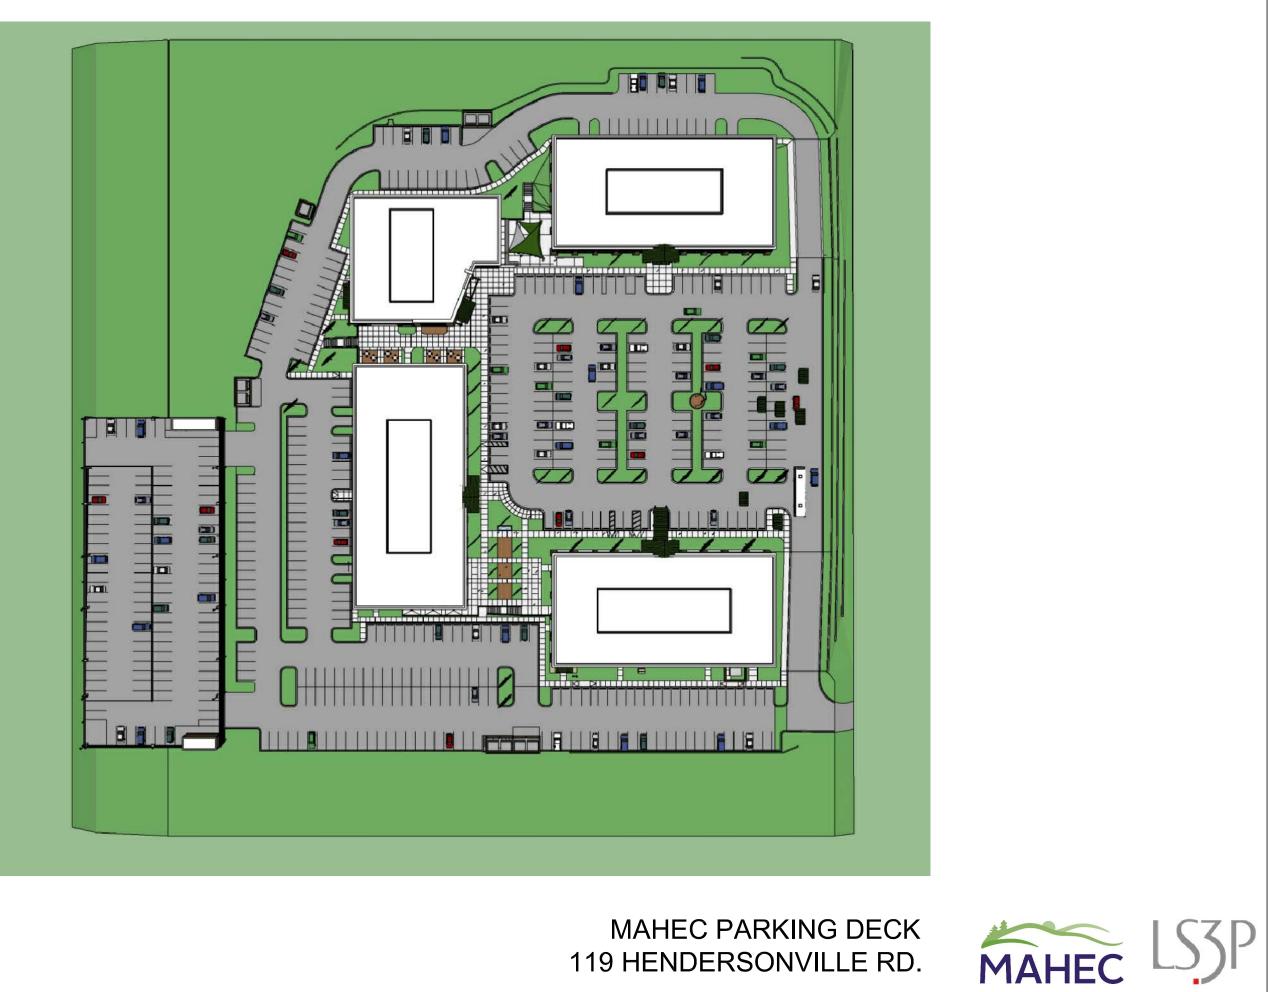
OVERALL SITE PLAN NOT TO SCALE October 28, 2019
